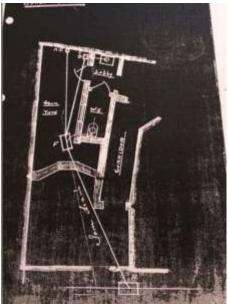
1924 drawing showing past rear courtyard arrangement.
